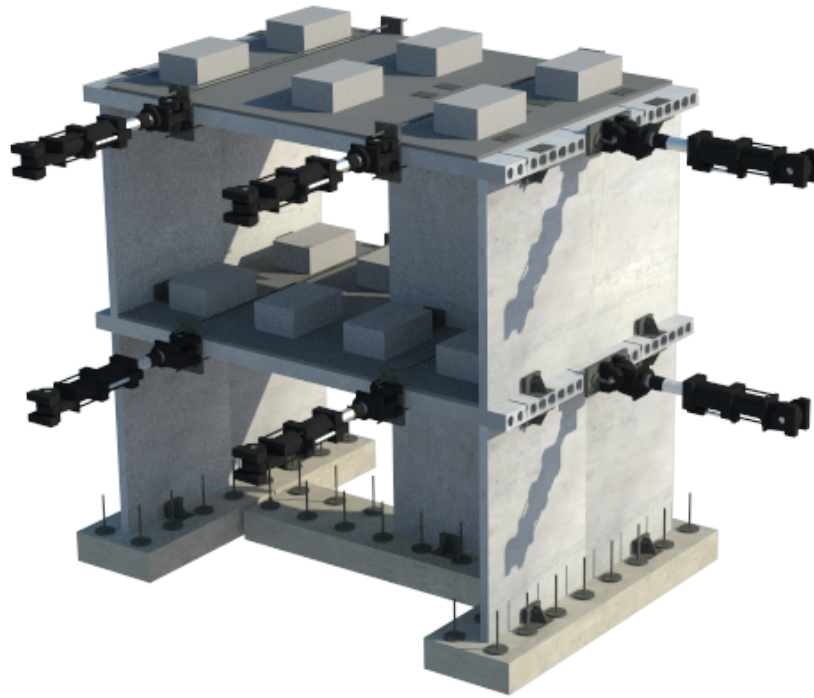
Isometric views of EUC-BUILD4 specimen and installation of experimental setup – South side.
